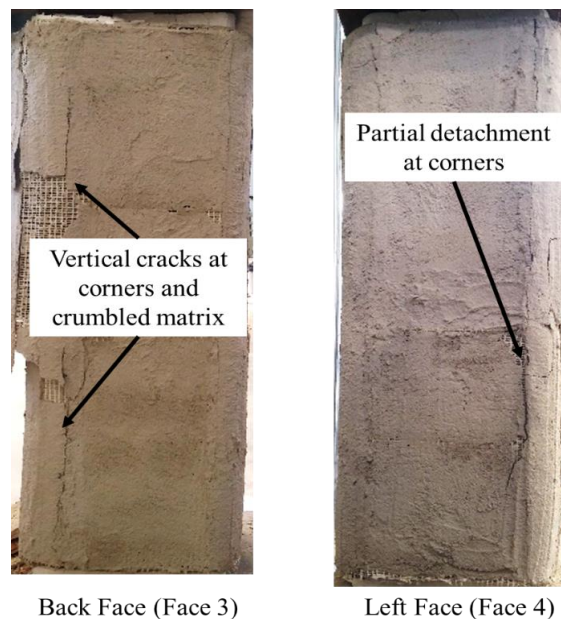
Specimen C-12-38-1-3 After Testing: Back and Left Faces
